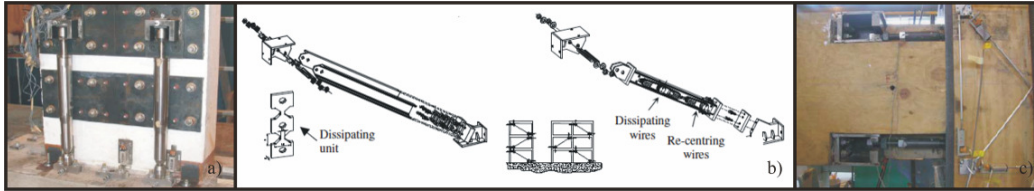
Dissipation a) at wall base (Marriott 2009) b) as bracing elements (Cardone et al. 2003) and c) at beam column joint (Iqbal et al. 2010)
